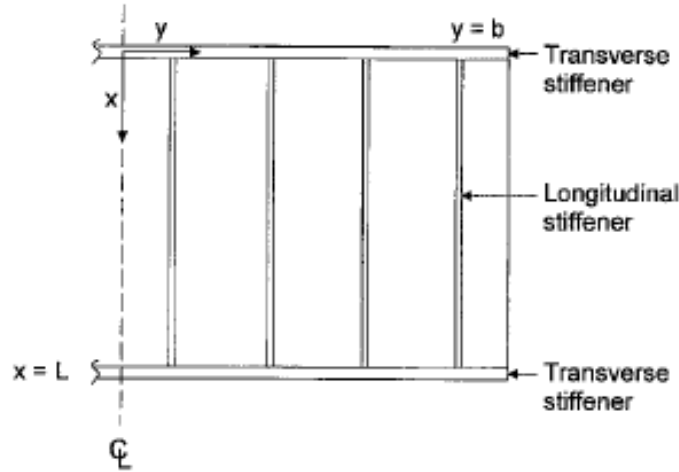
Stiffened plating consisting of plate and longitudinal stiffeners [4].
